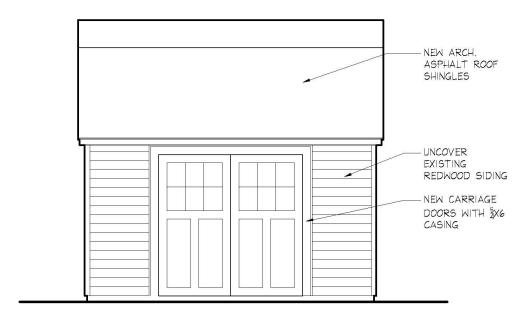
The proposed front elevation proposes new doors and removal of the vinyl siding.
